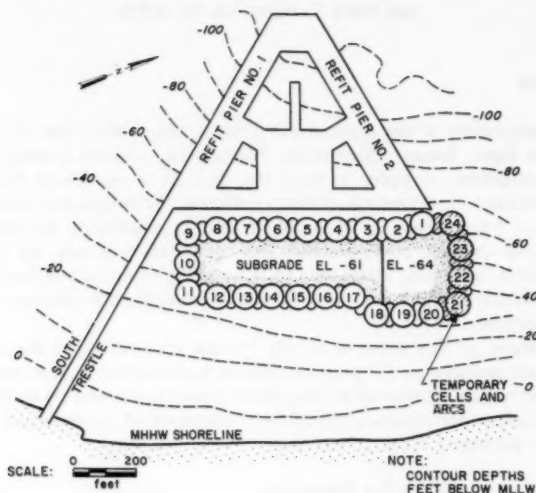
Cofferdam Plan (1 ft = 0.305 m)
